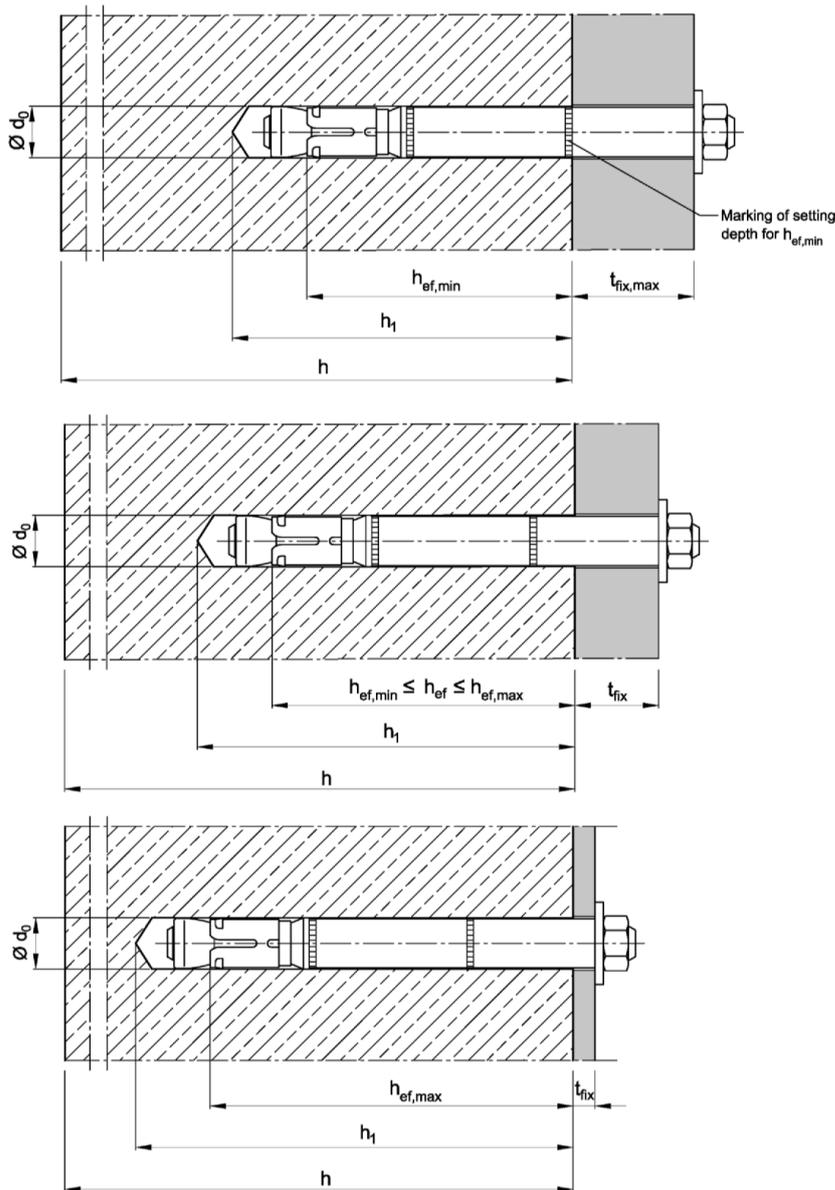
Example of an installation situation and nomenclature of the dimension after installation in steel fiber reinforced concrete.
